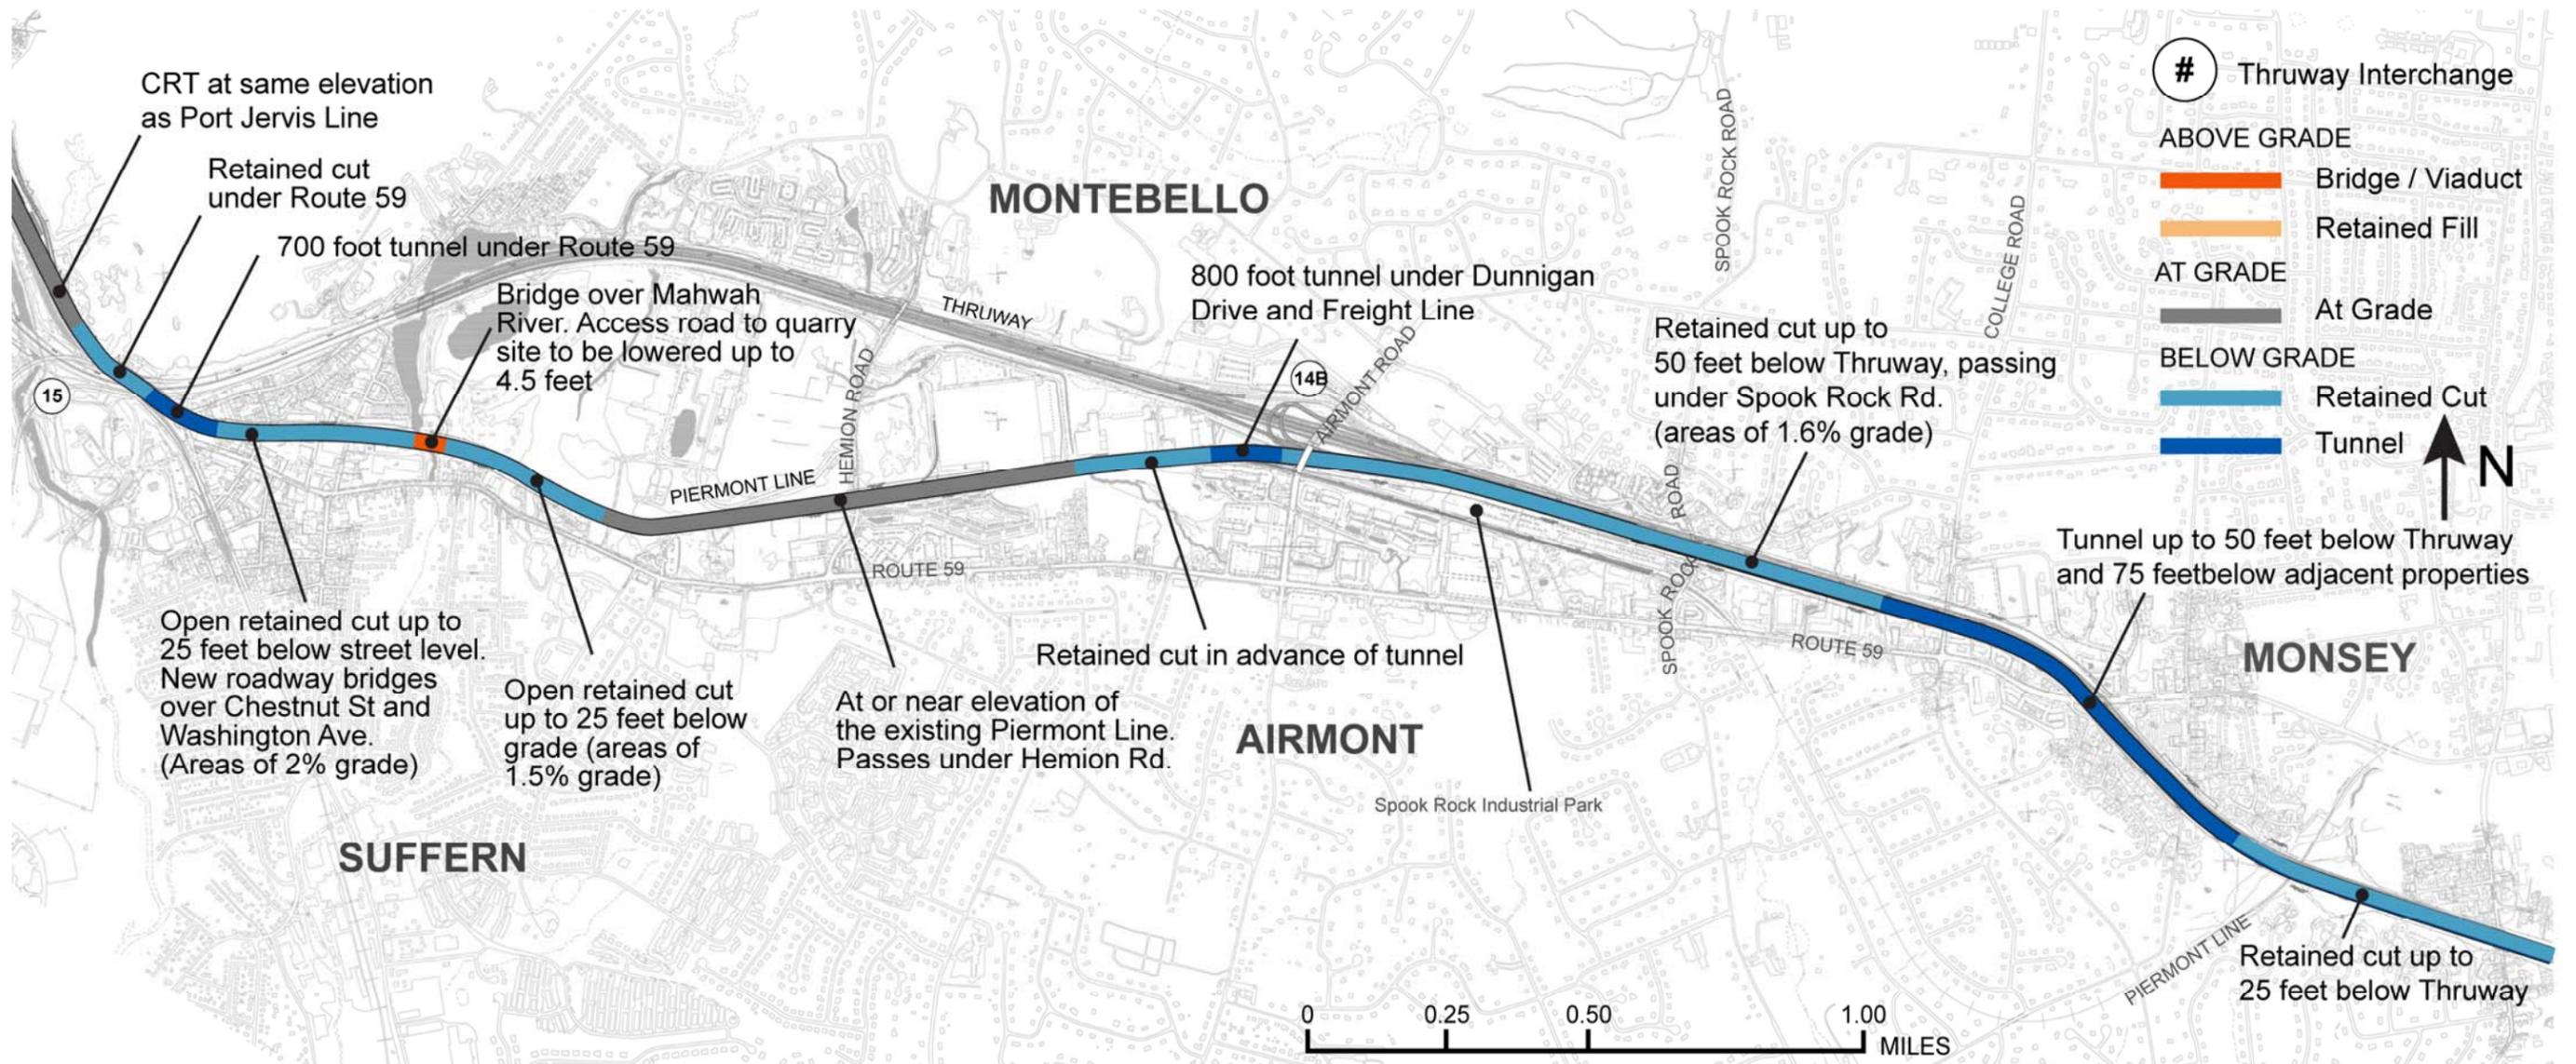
CRT in the Piermont Line ROW Under Airmont Road – Engineering Features
